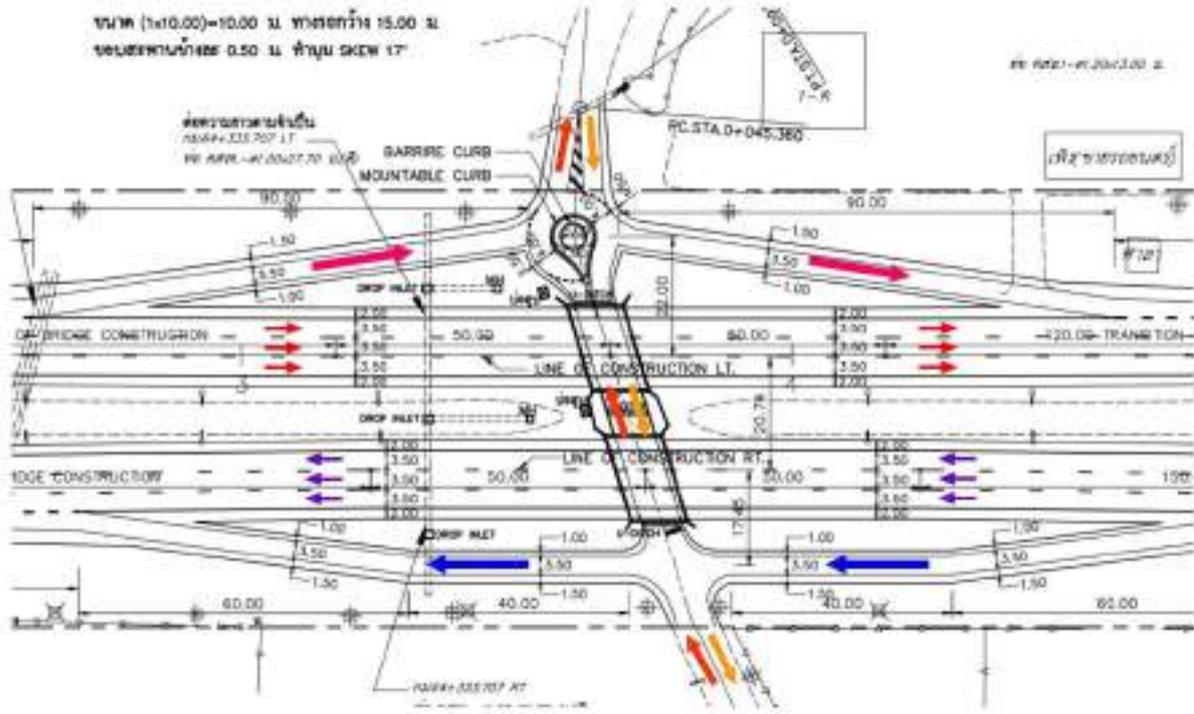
(Cont.) The construction plan and traffic patterns, including drainage, at the Po Koi intersection area
